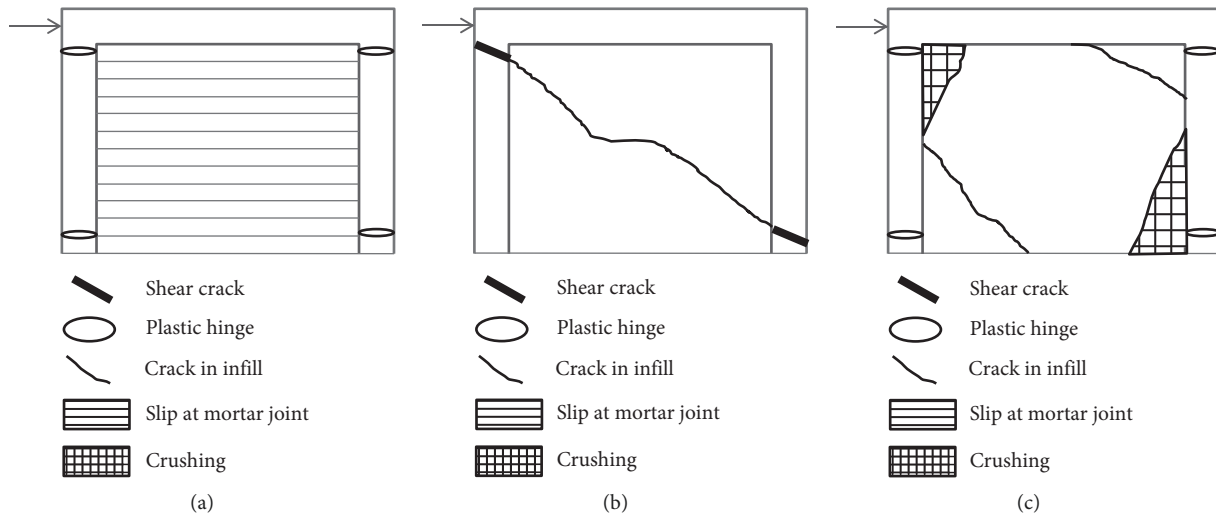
Three distinct failure mechanisms of masonry infills. (a) Horizontal sliding. (b) Diagonal cracking. (c) Panel or corner crushing.
